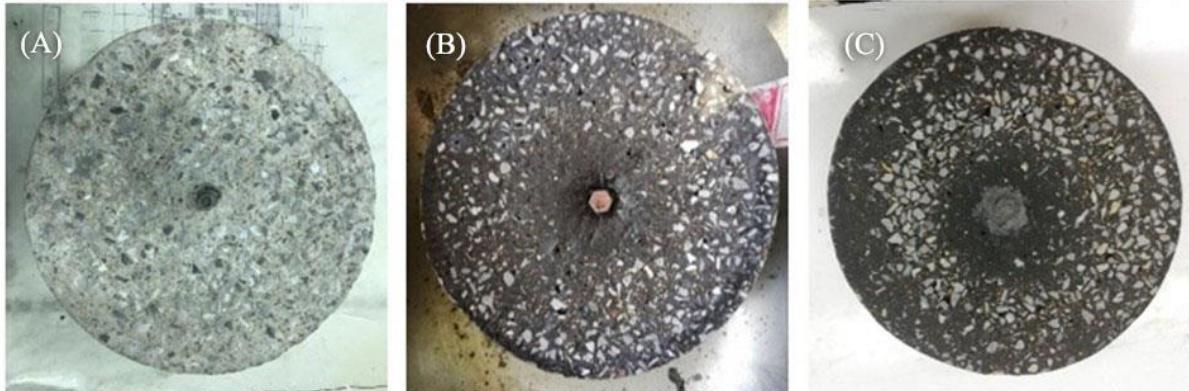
Abrasion specimens after testing, (A) OPC concrete, (B) O00 bagasse geopolymer concrete, (C) O05 bagasse geopolymer concrete.
